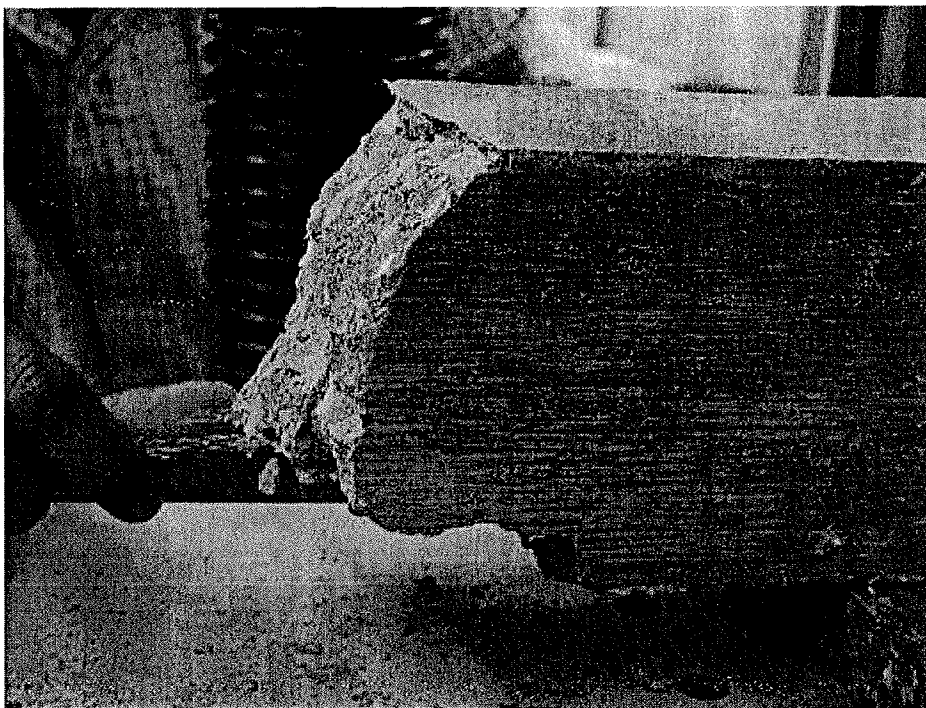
BRC-5 beam with flexural cracks. The picture also shows the loading arrangement, strain gauges and the LVDT's.
